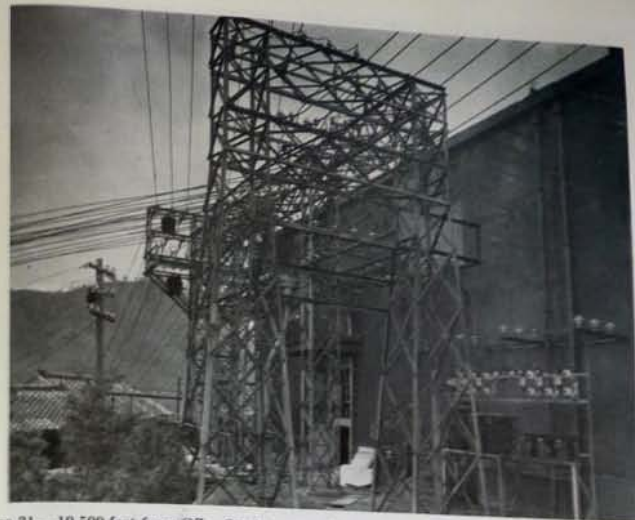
10,500 feet from GZ. Steel tower and circuit entrance to building, Akunoura Substation.
